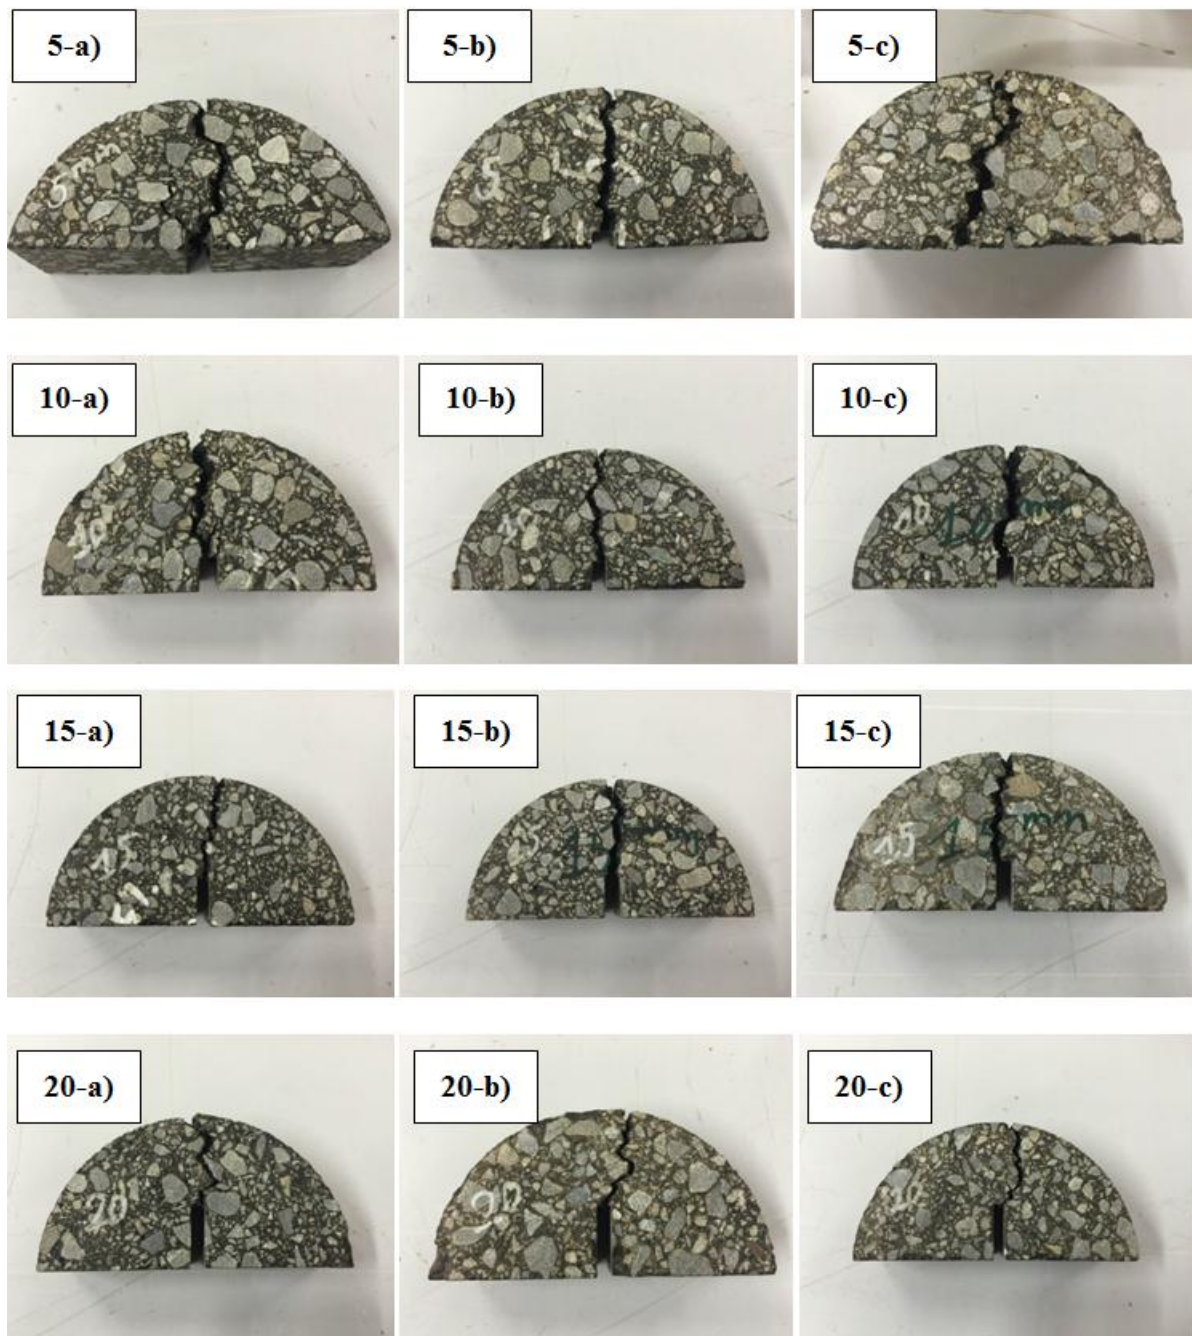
Typical SCB samples with 5, 10, 15, and 20 mm notch length after testing
